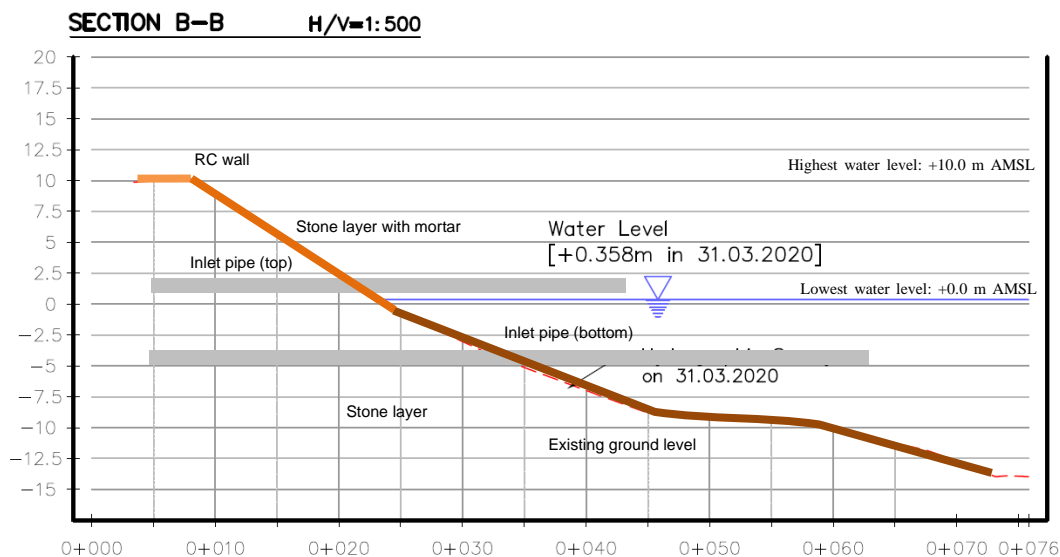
Outline Section of Proposed Protection of Revetment and Riverbed for Bakheng Phase III
